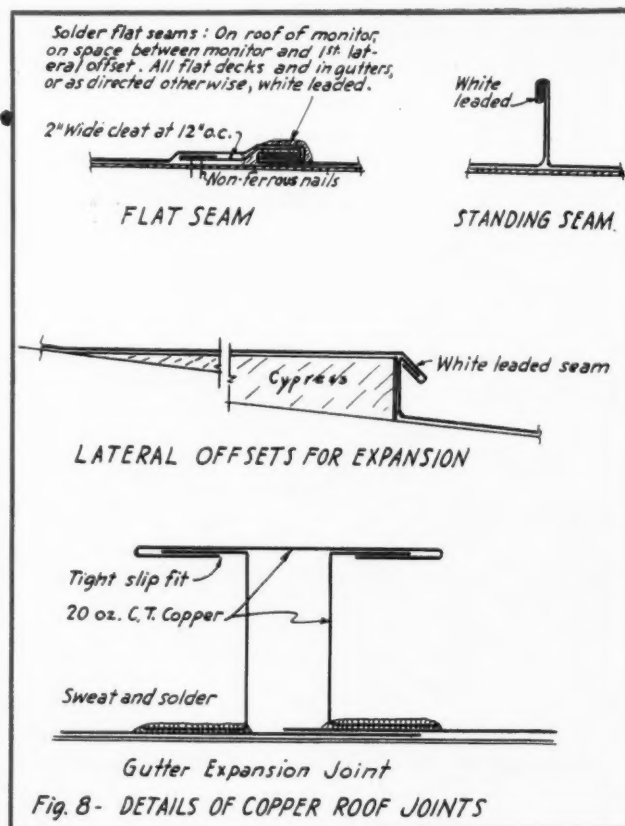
DETAILS OF COPPER ROOF JOINTS
